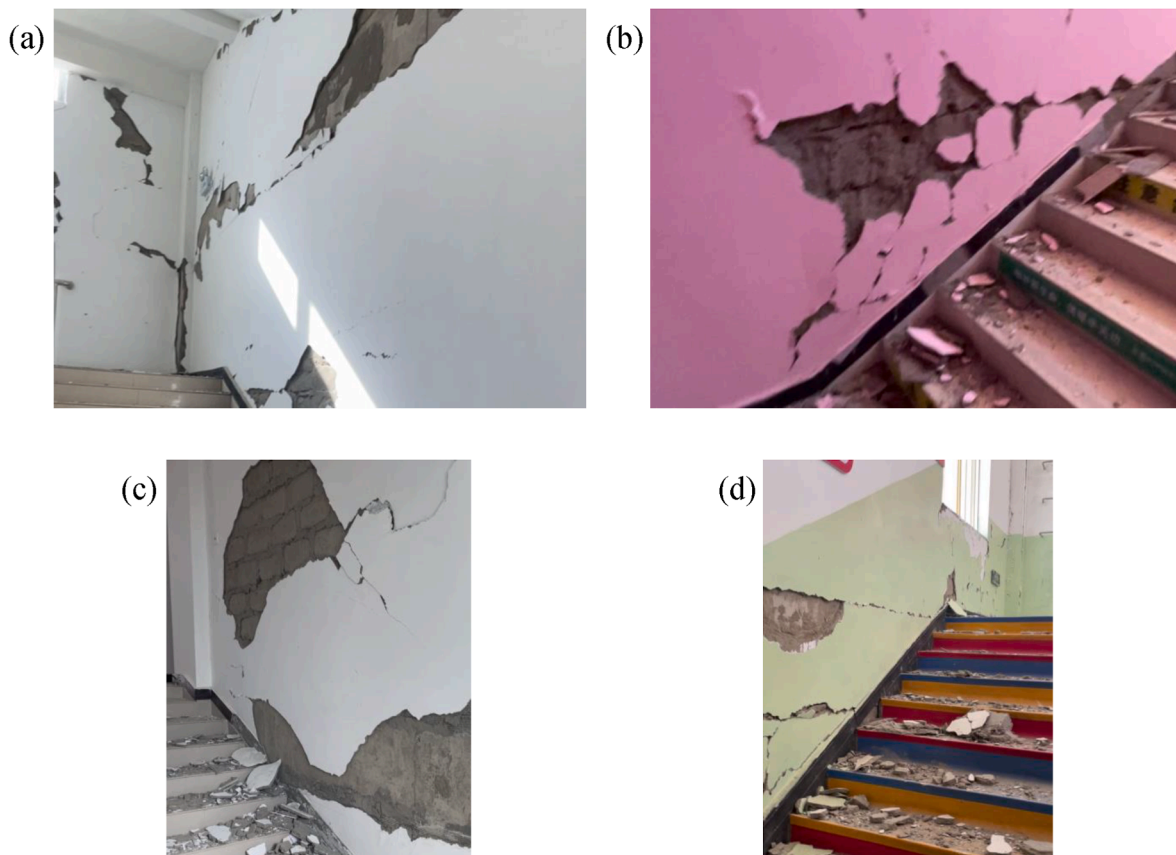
Seismic damages of stairwell walls, (a) town government office building in Changsuo Town, (b) health center outpatient building in Changsuo Town, (c) town government office building of Quluo Town, and (d) central primary school #1 teaching building of Quluo Town.
